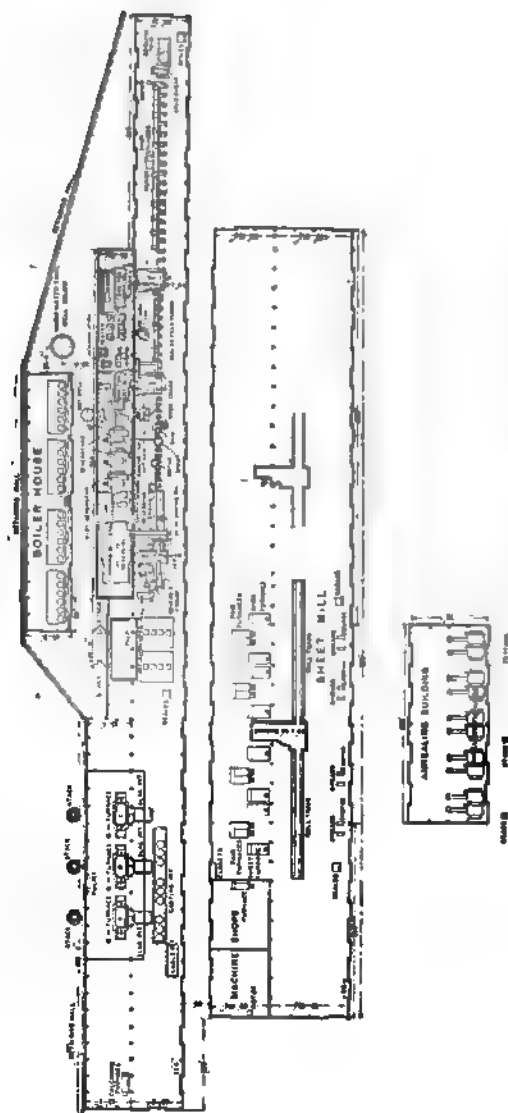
GROUND PLAN OF THE SHEET WORKS AT VANDERGRIFF.
